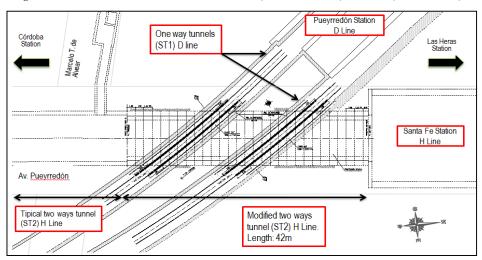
Crossing of Tunnel Line H under Tunnel Line D. Plan view.
